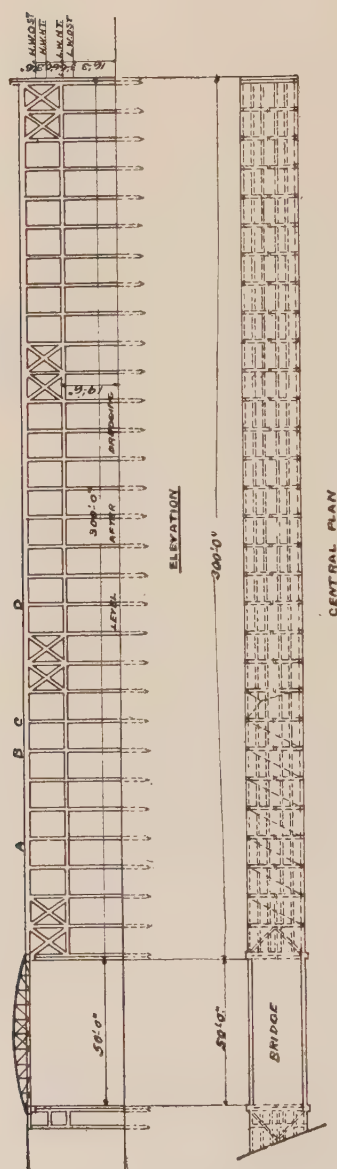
DETAILS OF COAL BARGE QUAY OF LONDON AND SOUTHWESTERN RAILWAY AT SOUTHAMPTON.
